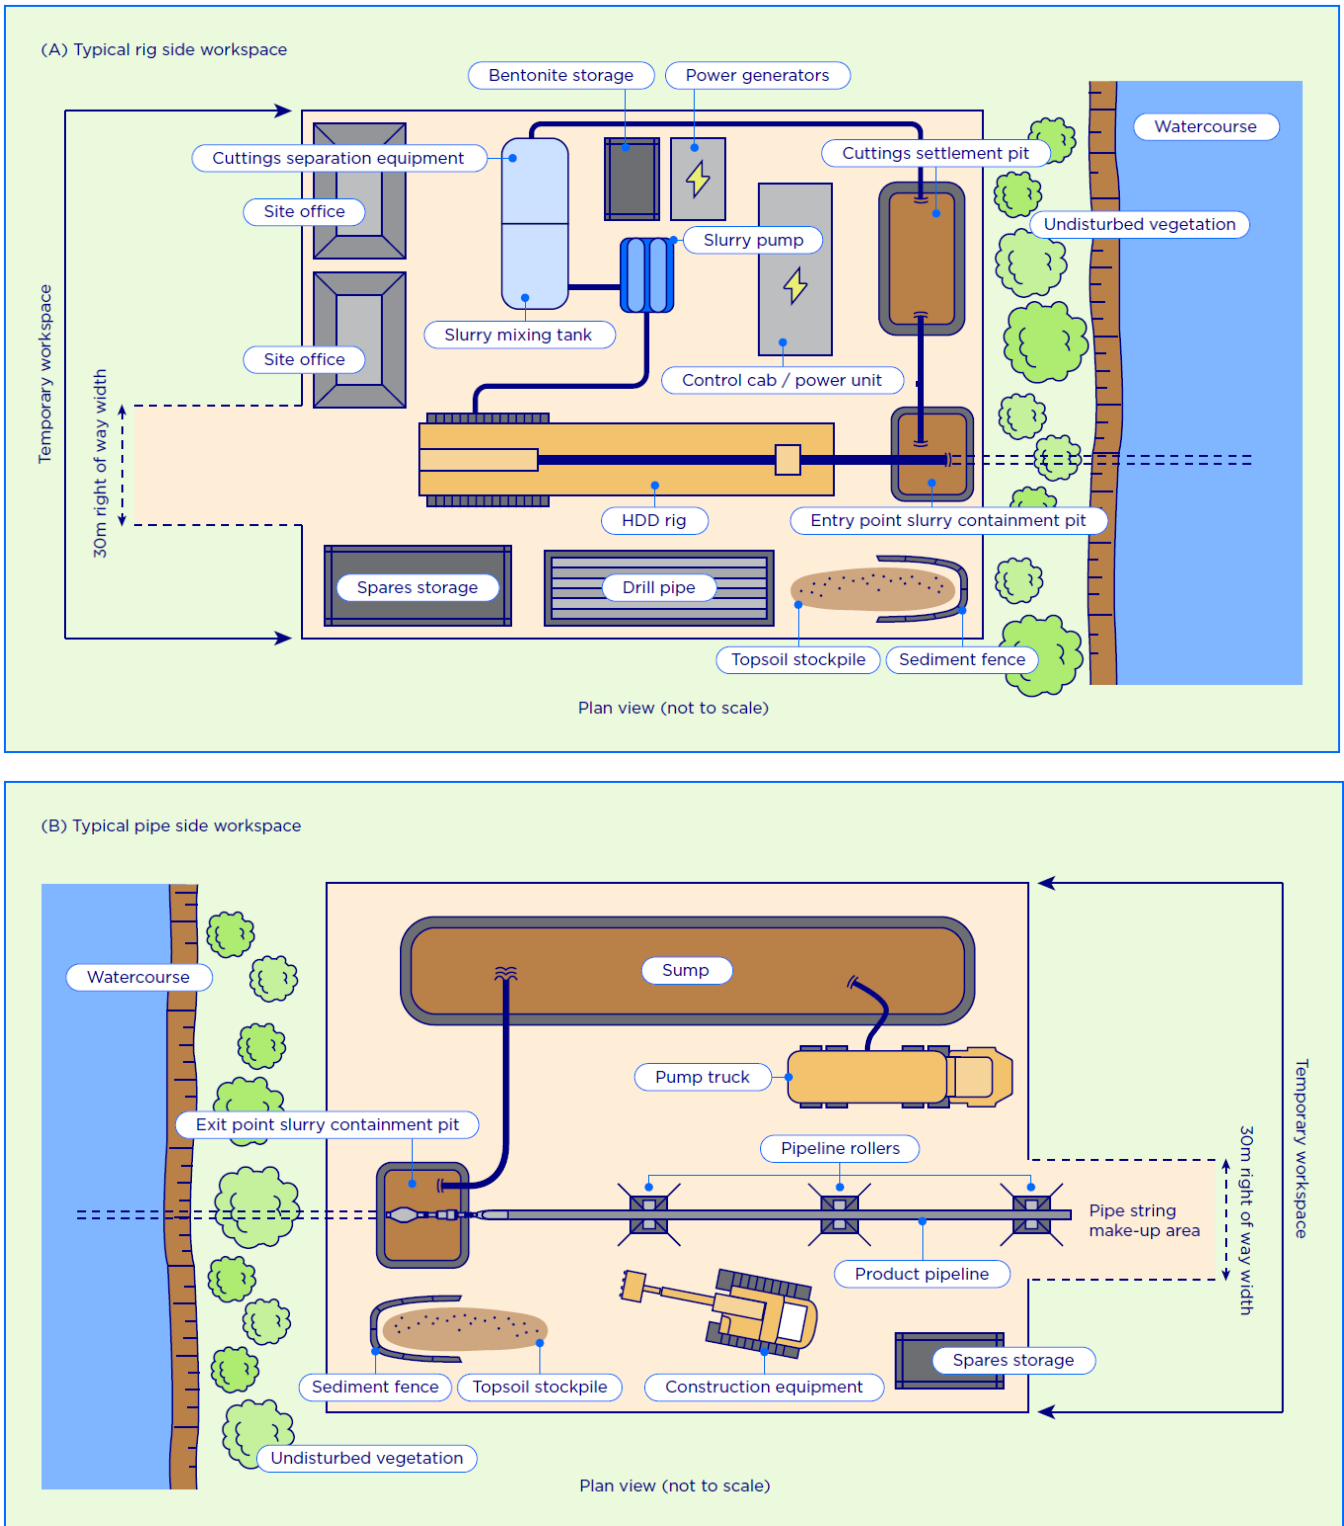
Horizontal directional drilling – indicative workspace layout
